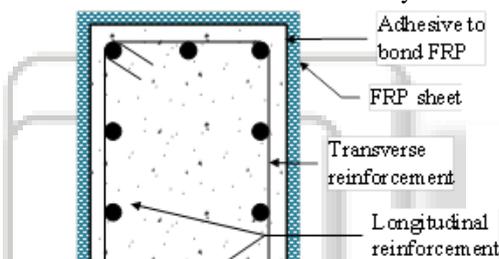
Conceptual model of column wrapped with FRP sheets.
